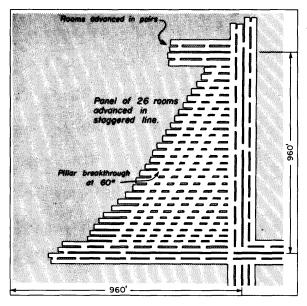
Plan view of a 26-room panel at the Caledonia Mine.
